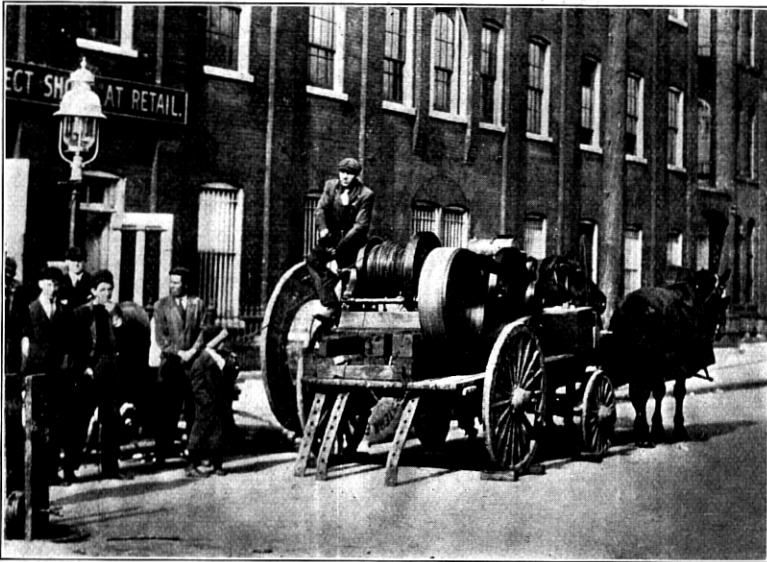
Old Type Gasoline Engine Driven Winch on Horse-Drawn Truck
